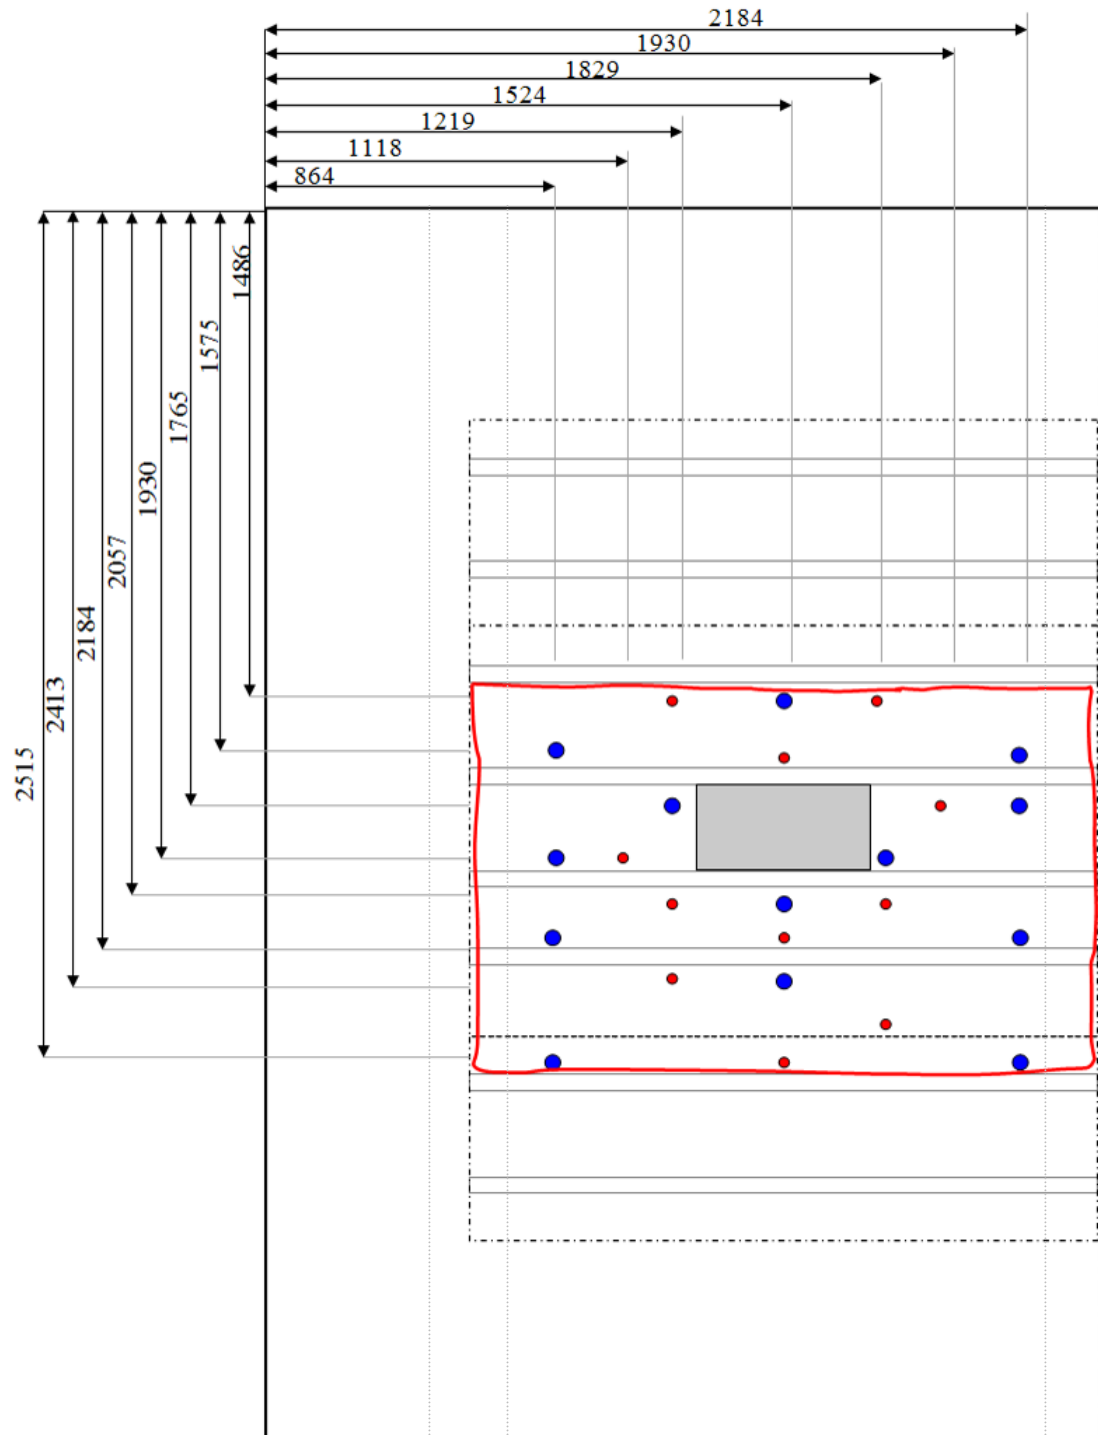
Detail of hole pattern arrangement for repair of FRP side deck
